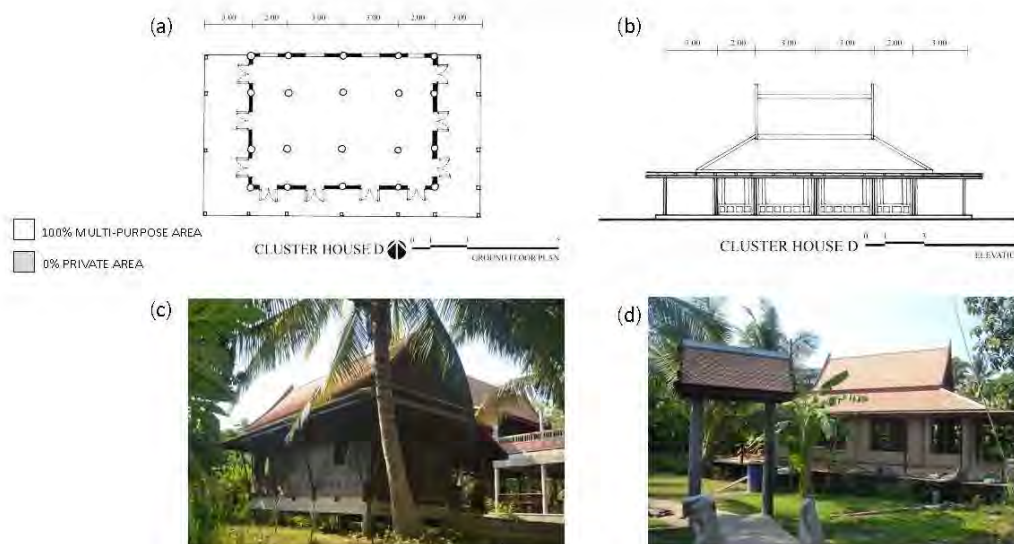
Cluster House D (a) Plan (b) Elevation (c) House D#3 (d) House D#4
